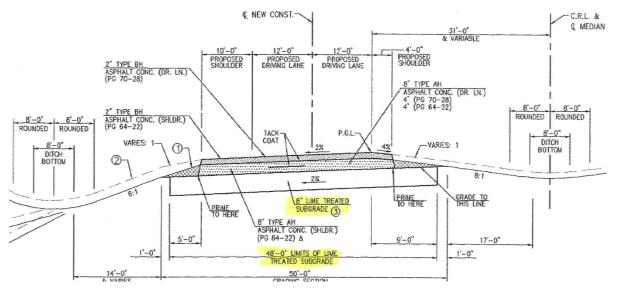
Original design cross section US 183 Clinton, Oklahoma
